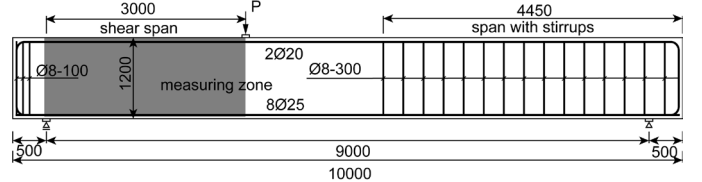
A sketch of beam configuration including beam dimension, reinforcement layout, locations of supports and load and measuring zone.
